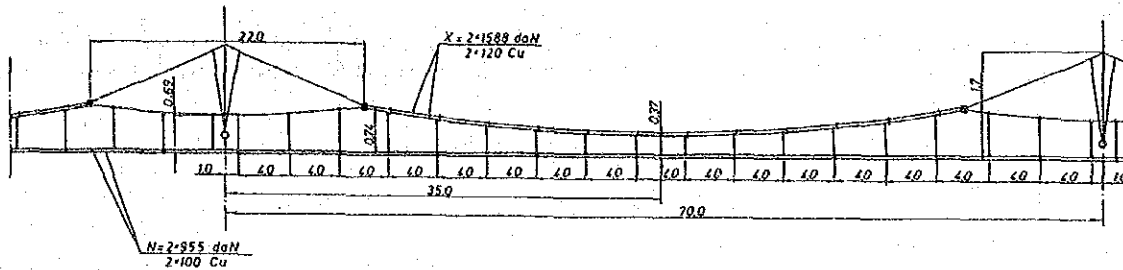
3KV Overhead Contact Wire Equipment on CMK
